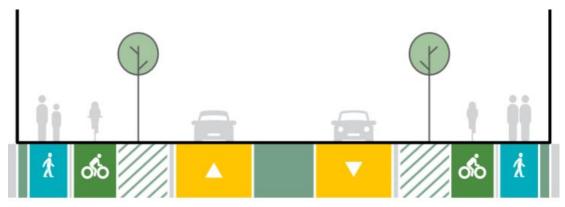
NOR W1 Trig Road (North) typical cross section - corridor
